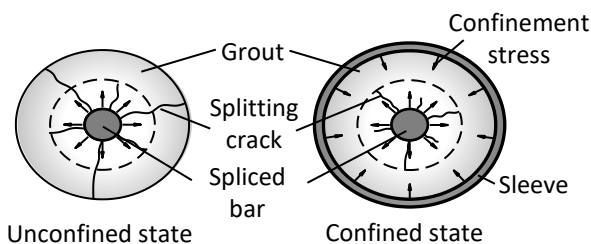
Grouted sleeve connector as the connection of precast concrete walls (Loh, 2008)
